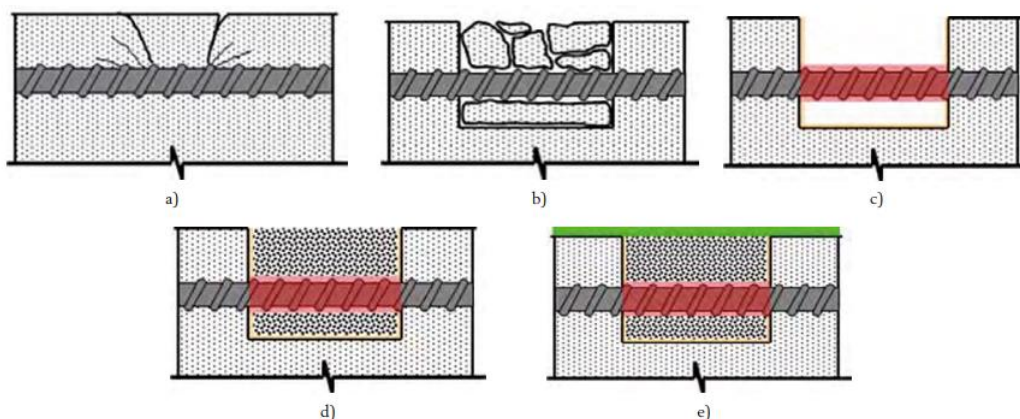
Stages in patch repair: a) inspection to detect damaged areas; b) removal of damaged concrete; c) reinforcement de-rusting and primer application; d) geometric restoration, and e) replacement of concrete cover.
